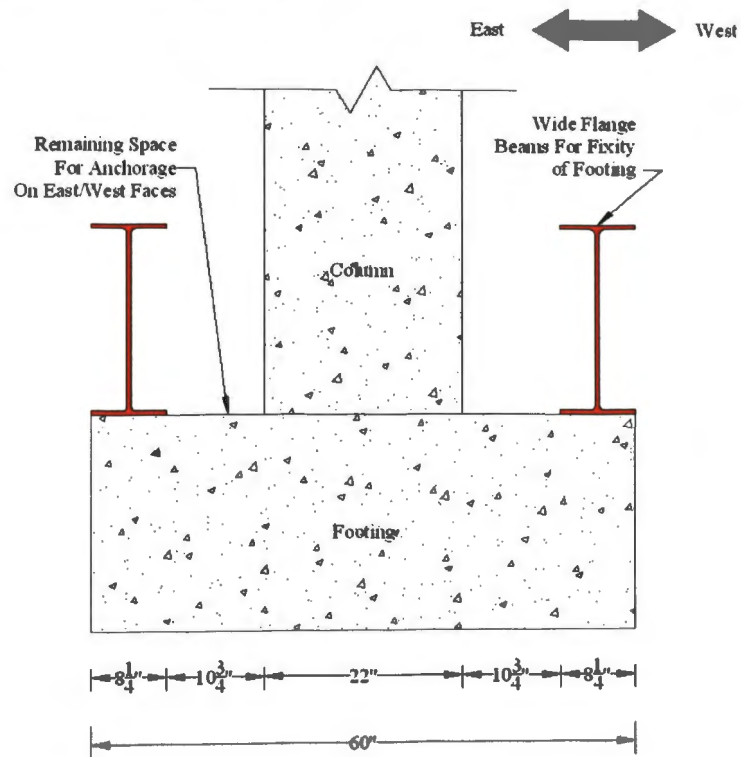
Restrictions Imposed on Anchorage Design For East and West Sides
